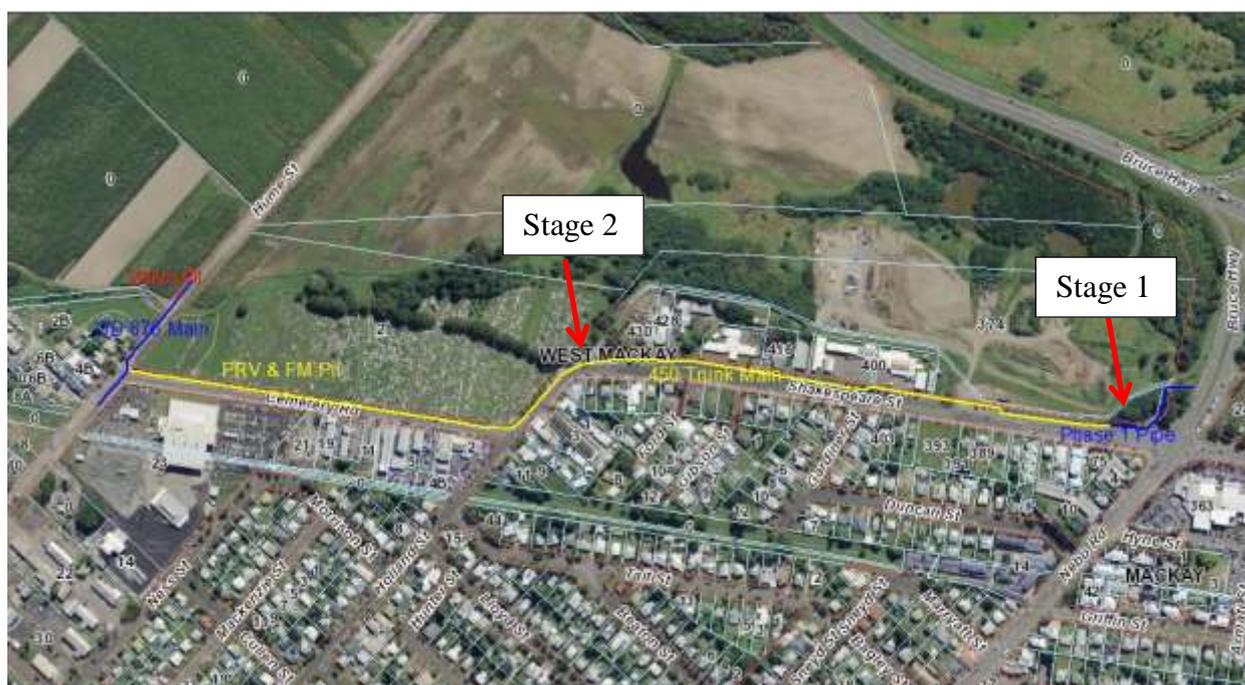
Cemetery Road Trunk Water Main: Stages 1 and 2
